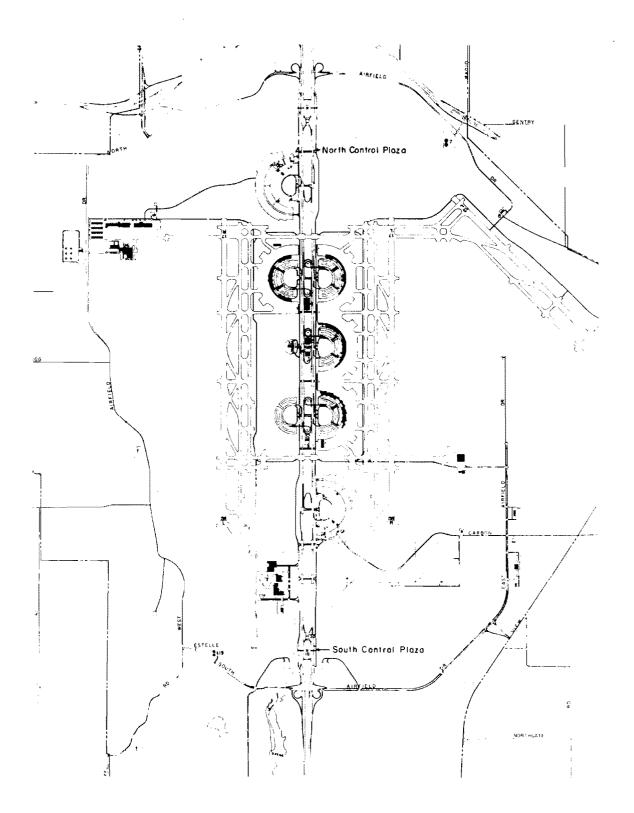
Detail Plan Showing DFW Internal Roadway System.
